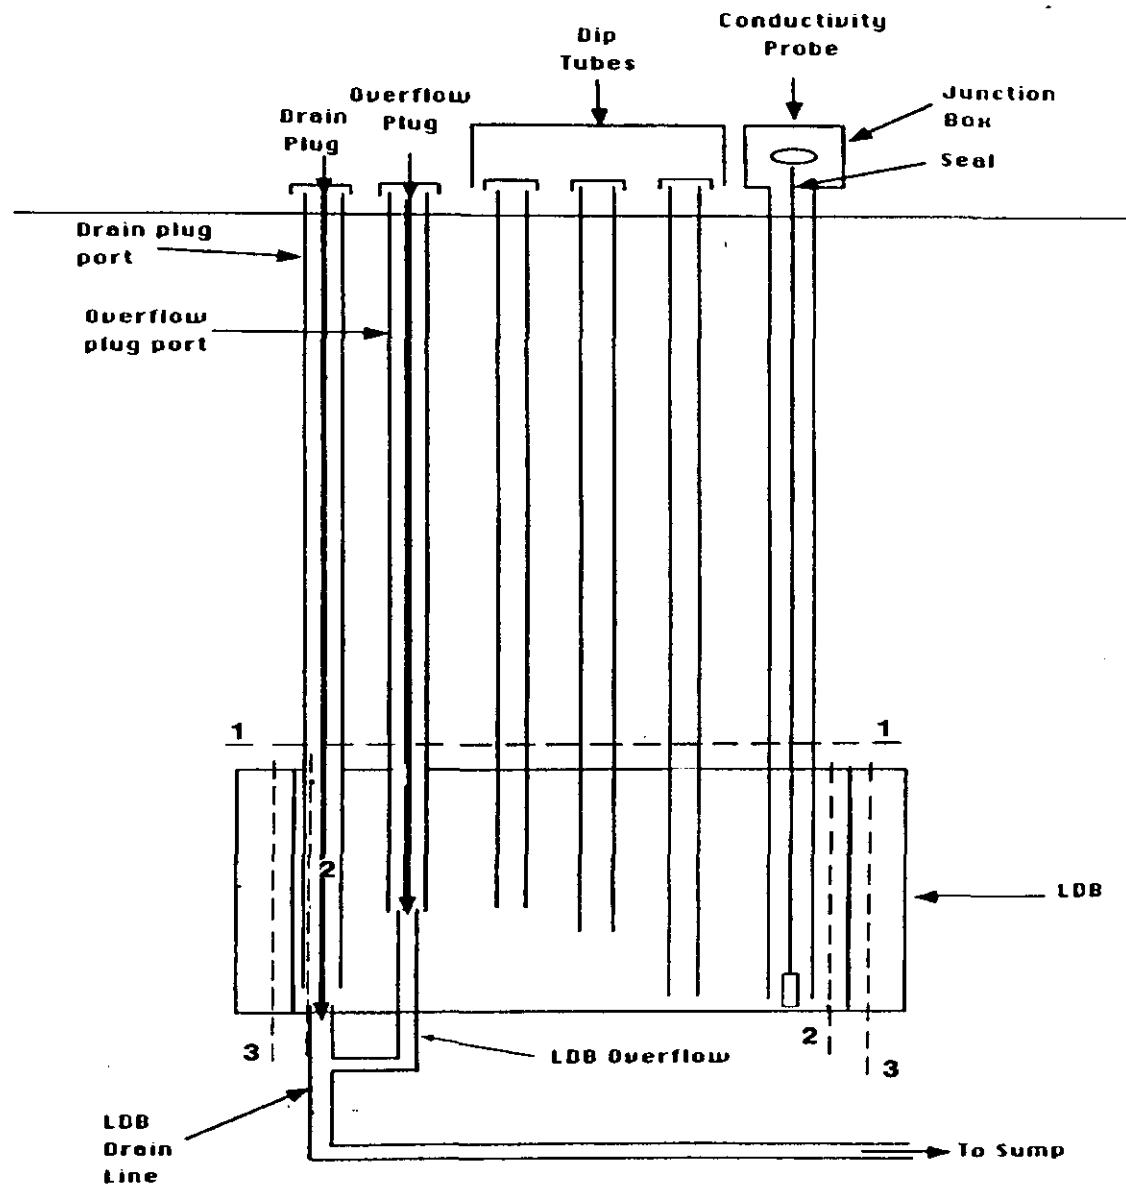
Schematic drawing of weld section cuts made in Tank 40 LDB
